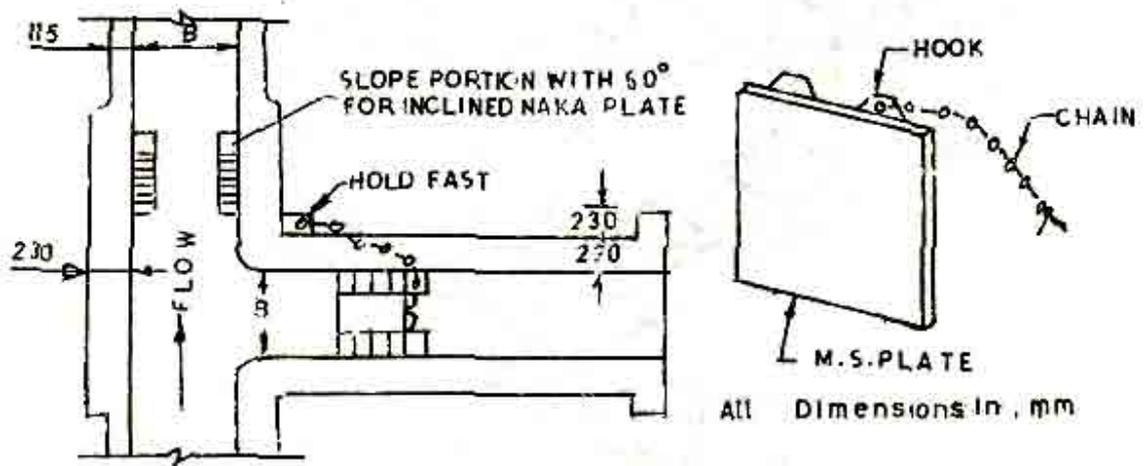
Typical Design Of M.S. Plate Nakka Structure
